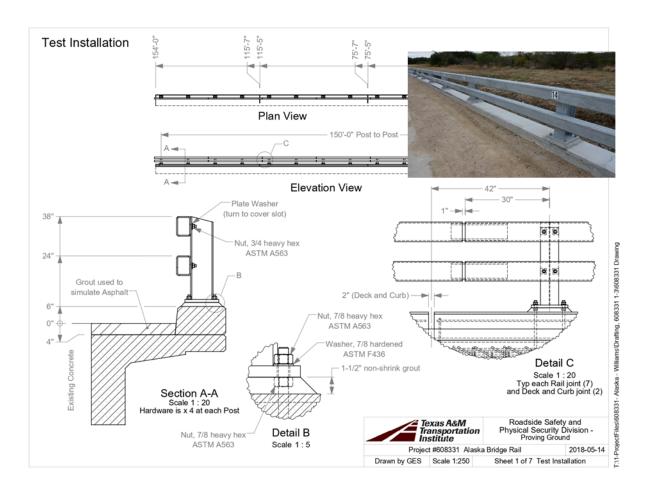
Details of Alaska 2-Tube Bridge Rail
